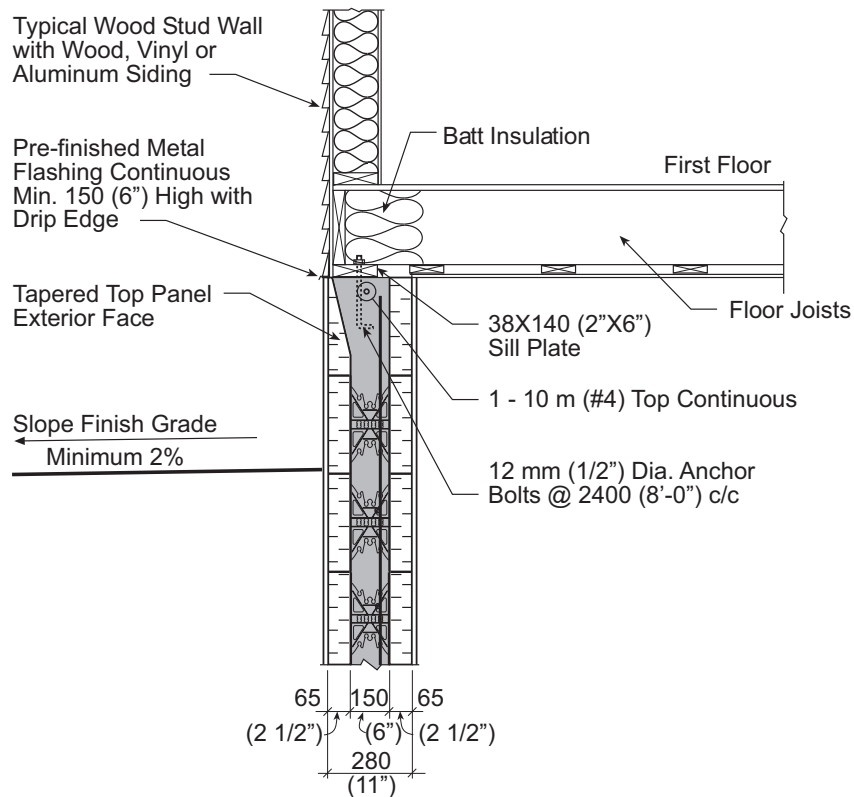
Typical section of “IntegraSpec®” wall system supporting wood, vinyl or aluminum siding.
